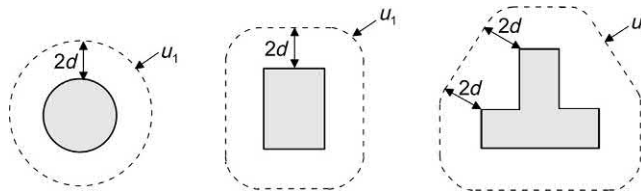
Typical basic control perimeters around simple loaded areas. Modified after EN 1992, 2004. *Design of Concrete Structures – Part 1-1: General Rules and Rules for Buildings*. British Standards Institution, London, p. 225.
